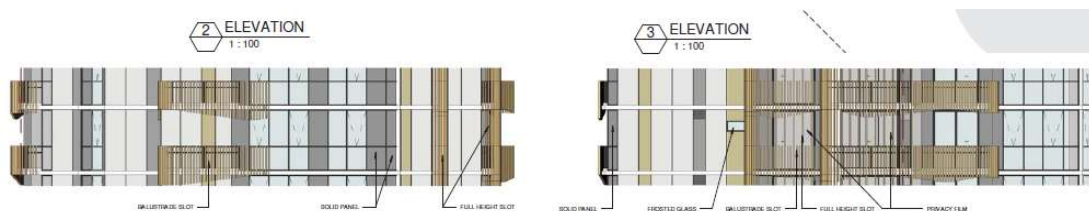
Proposed privacy treatments to protect amenity of adjoining approved tower (inc. previous page).
